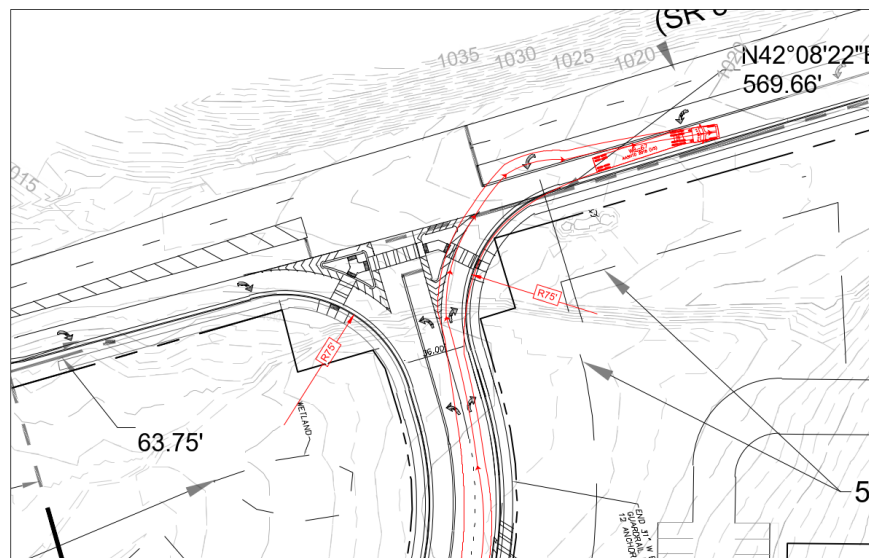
Winder Highway (SR 8/US 29) at Stanley Road – Northbound Right (Exiting Truck)
